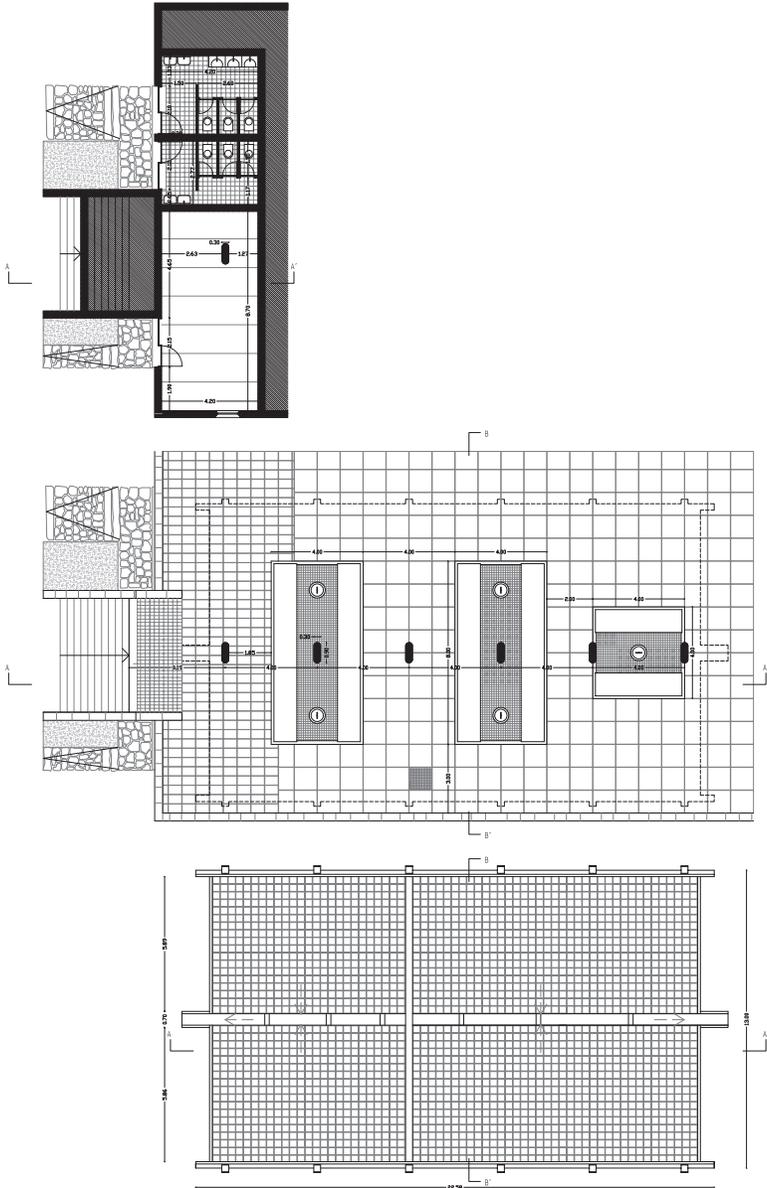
2015 Survey of the Municipal Market of Santa Maria da Feira; pavilion P3 ground floor plan, first floor plan and roof plan.
